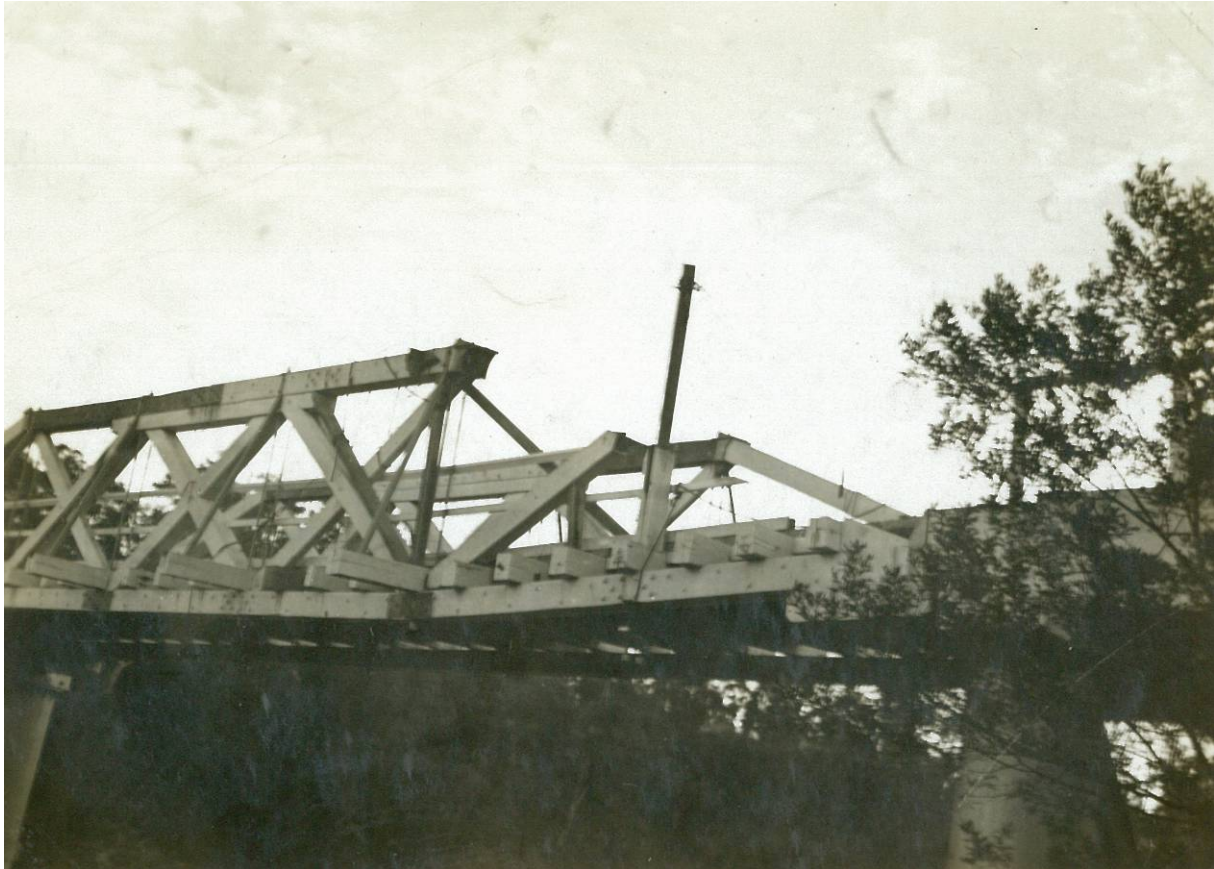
Clarence Town Bridge Bottom Chord Failure during Maintenance Works in 1943
